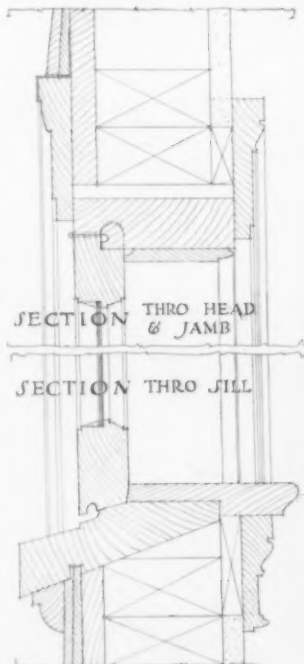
Detail of Wooden Casements Opening Out, Set in a Frame Wall
